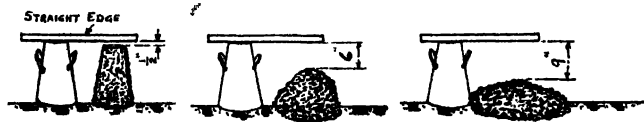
TYPICAL CONCRETE SLUMP TEST
